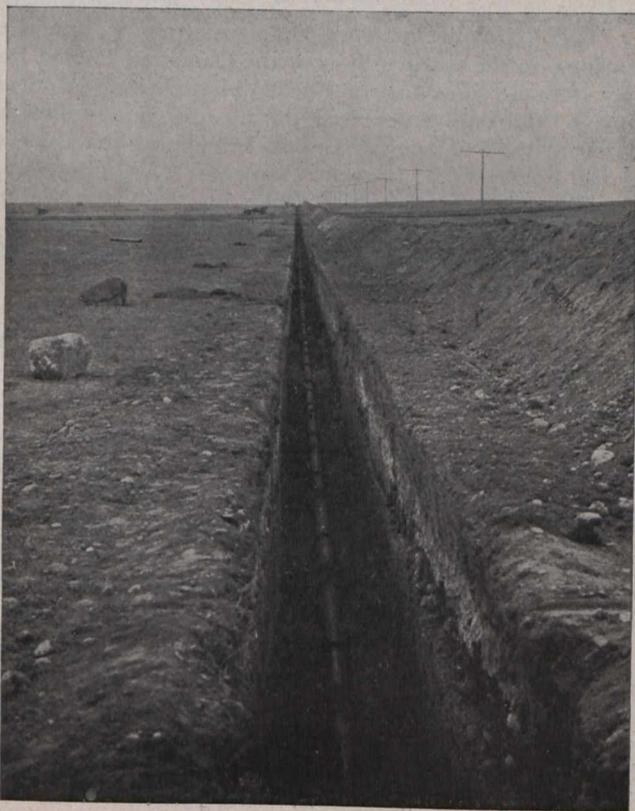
Excavated Ditch, Showing Some of the Boulders Moved by Machine.
